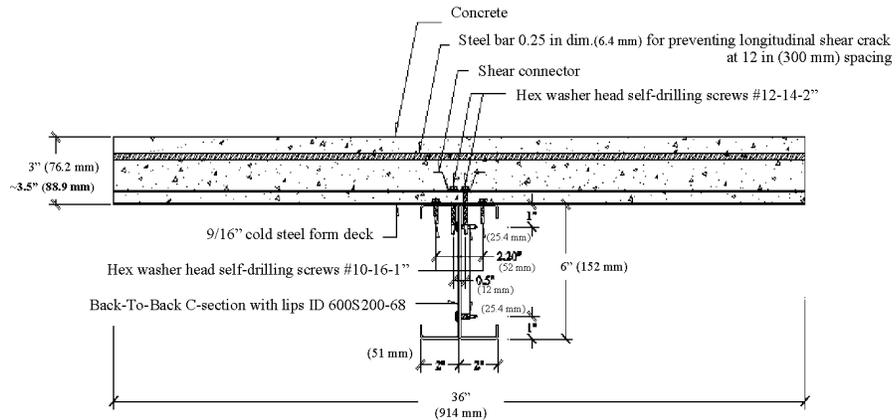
Composite section and details of connection (Specimens CB2, CB4 and CB5)
